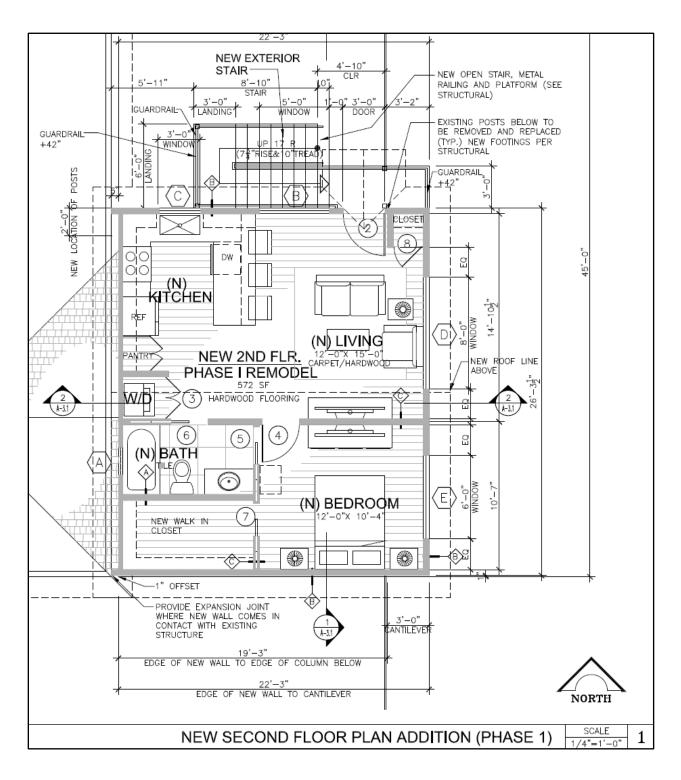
PROPOSED ADU FLOOR PLAN
